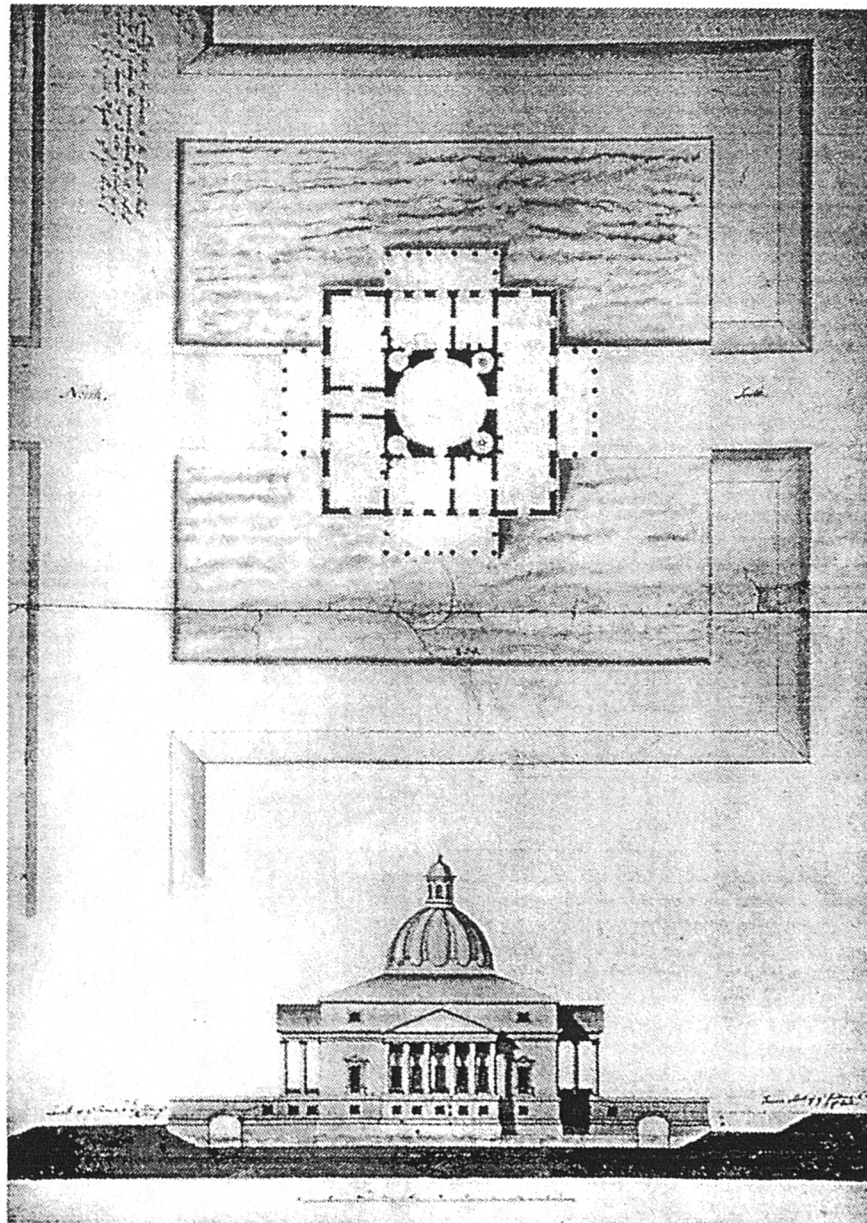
Mereworth Castle, Kent, Colen Campbell. Plan of villa and moat and elevation of front with section through moat. Pen and wash (730x510).
